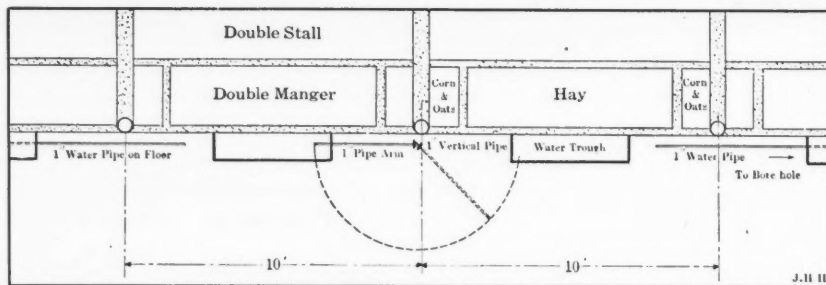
PLAN SHOWING ARRANGEMENT FOR DOUBLE STALLS AND METHOD OF SUPPLYING WATER TO TROUGHS
